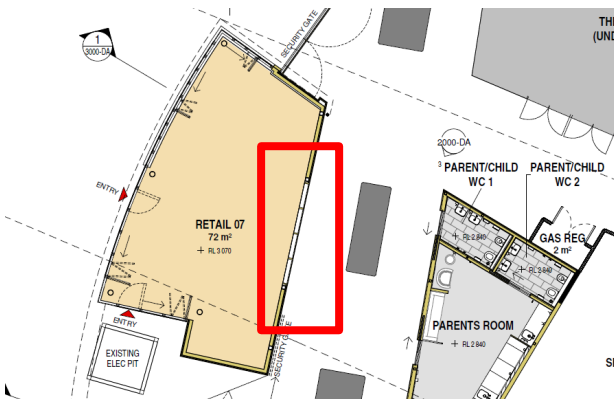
SHFA building ground floor, as proposed with Retail Tenancy 08 removed
